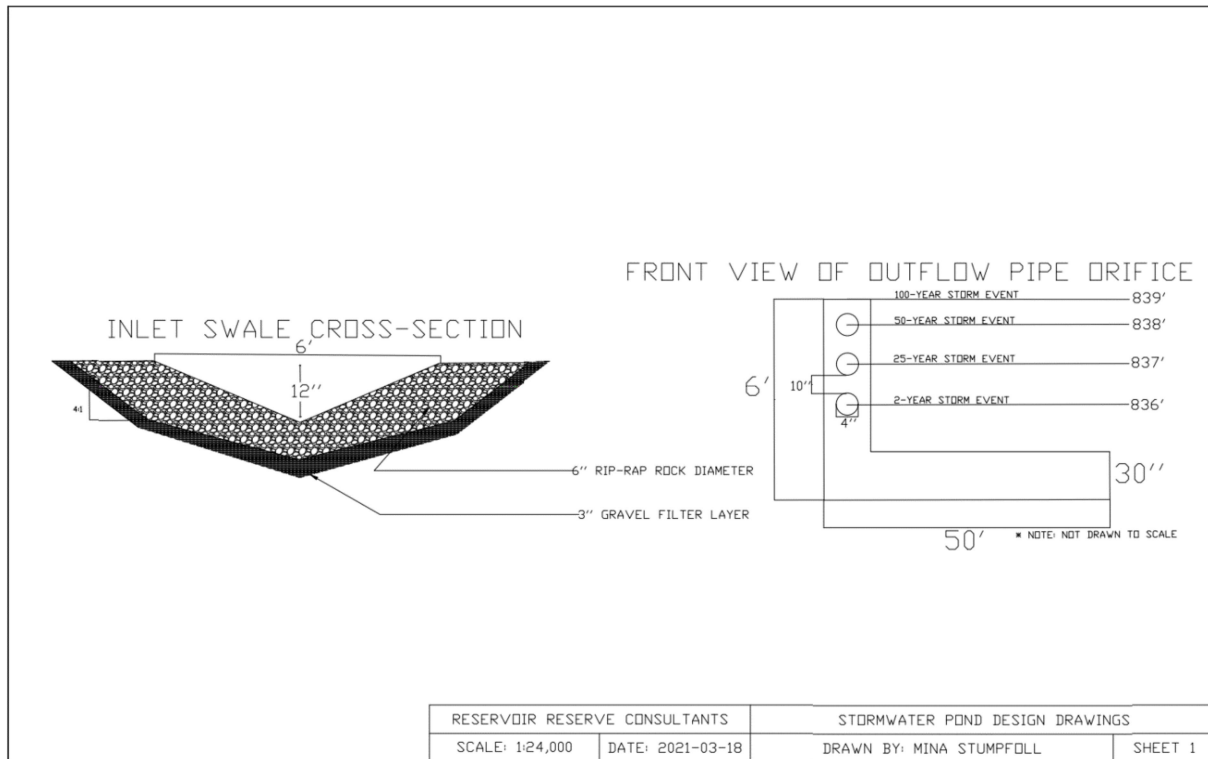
Cross-sections of the inlet swale and outlet piping system.
